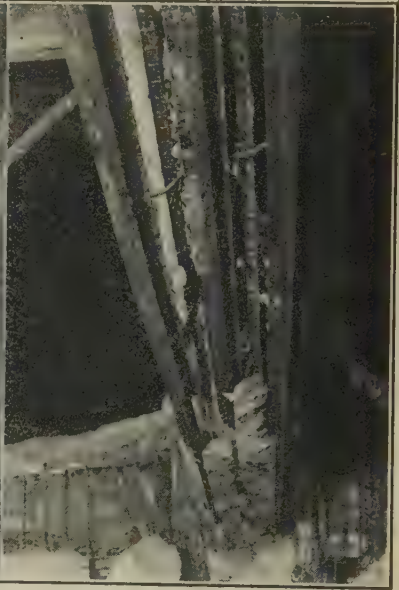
VIEW OF GIRDER IN COLLAPSED PORTION OF FOURTH FLOOR.
